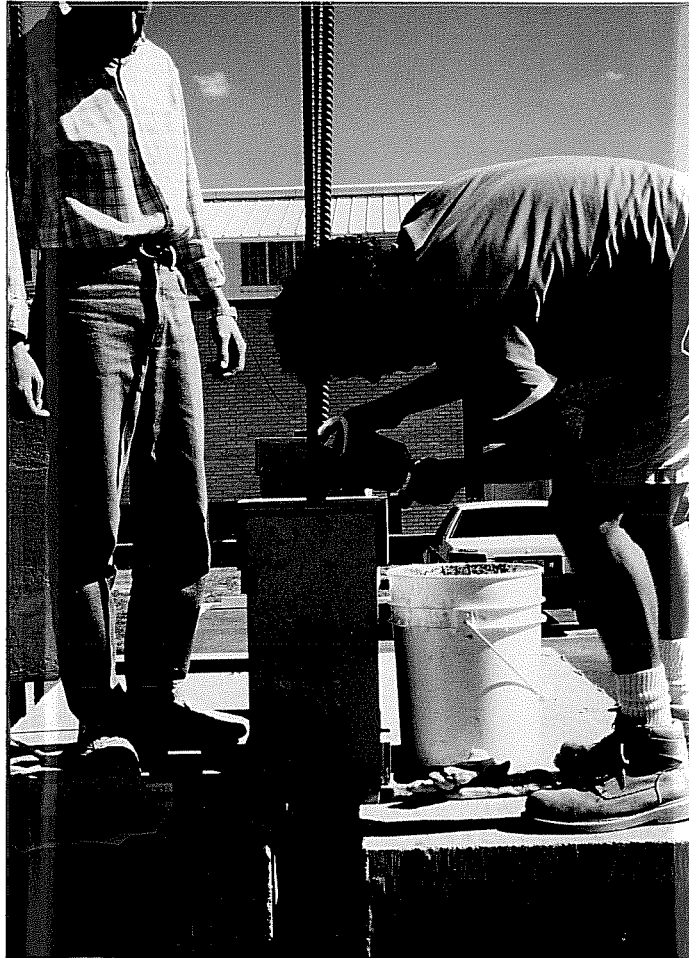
Flowable Non-Shrink Grout Placement In Specimen
